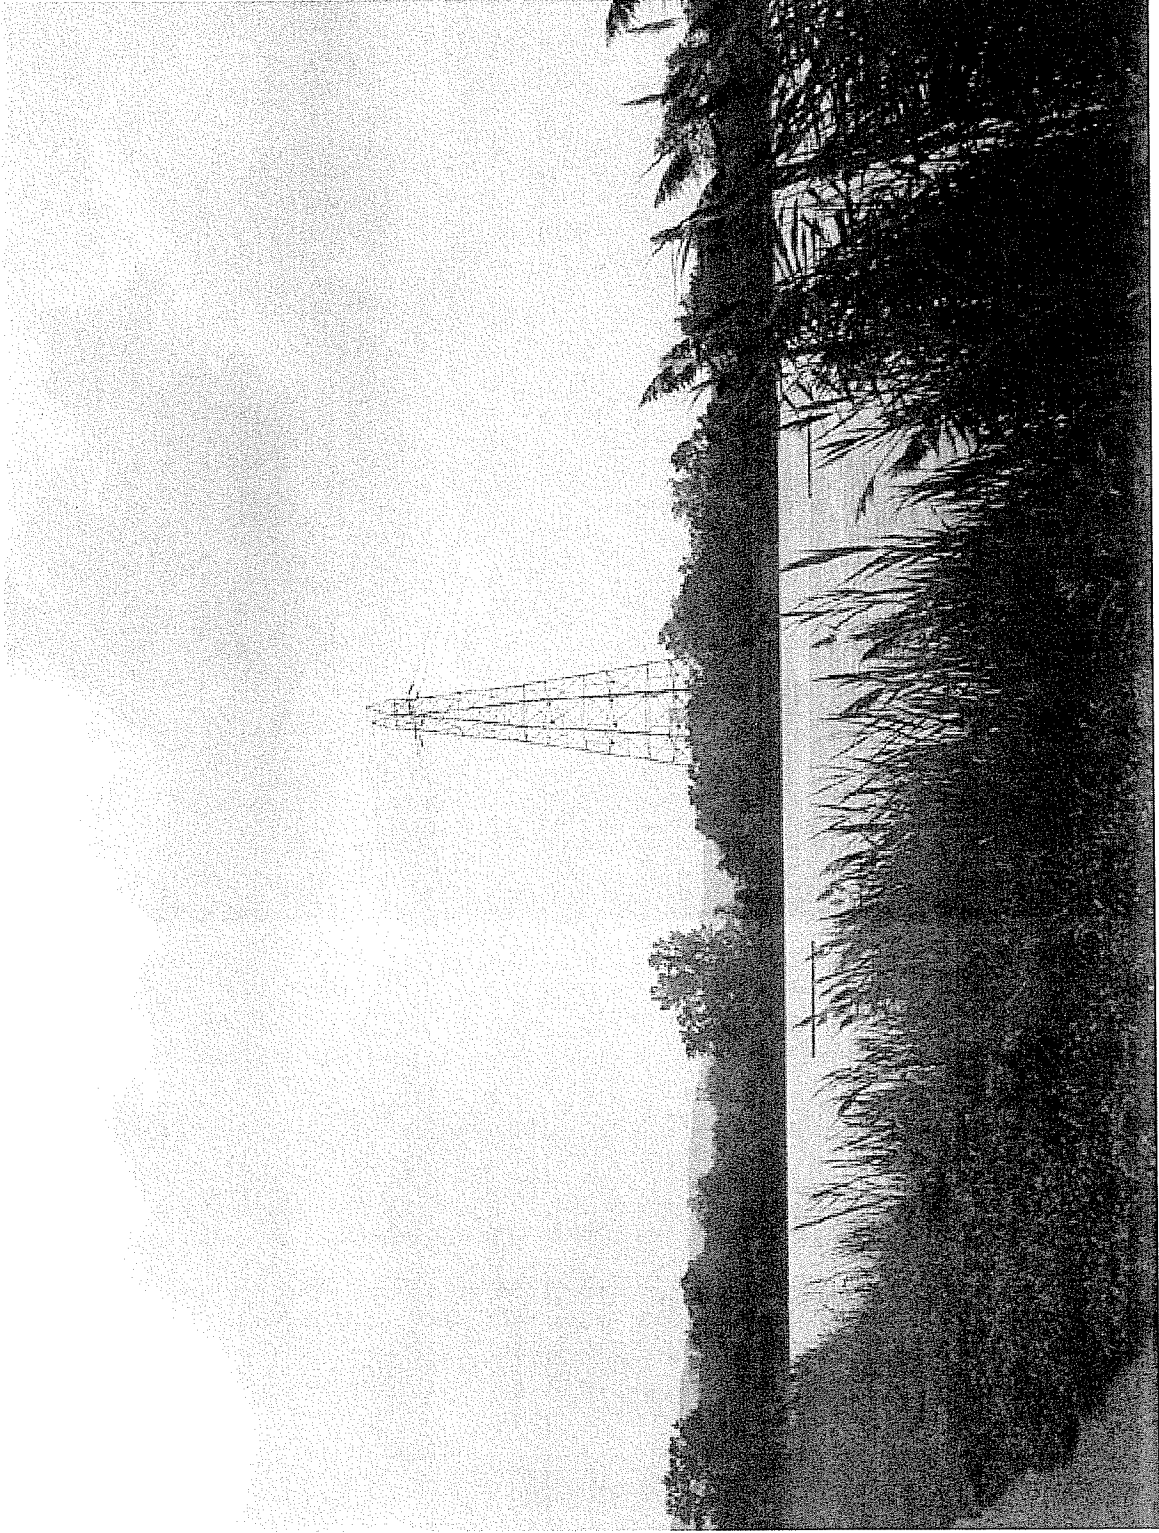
Facing East. Existing Kentucky Utilities 138-kV Transmission Line Structure with Ash Pond in Foreground.
